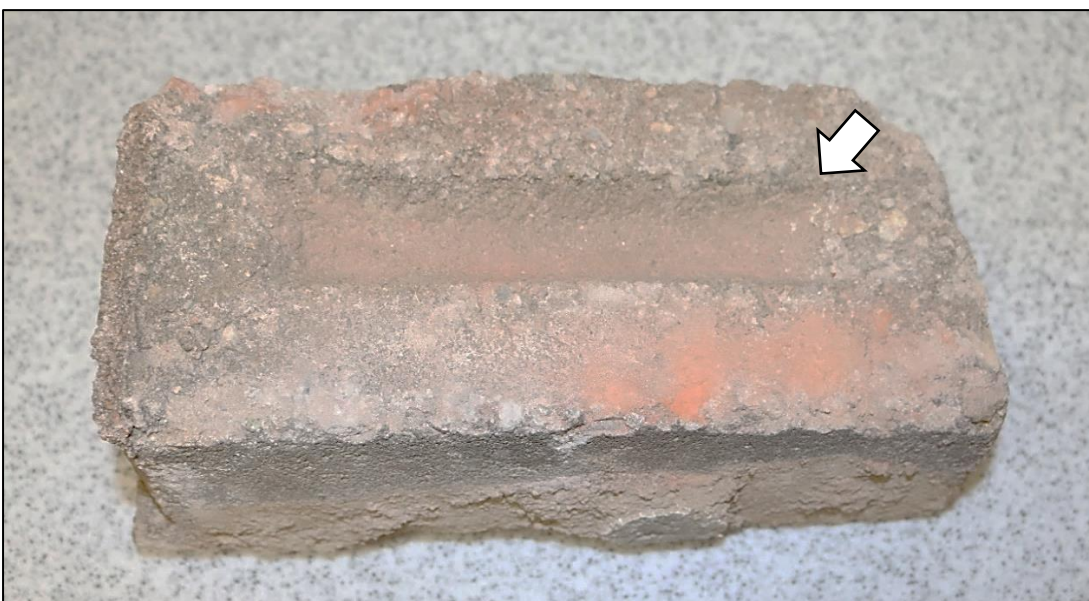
Image of a grey brick, with a frog in the brick, collected from Building 1.
